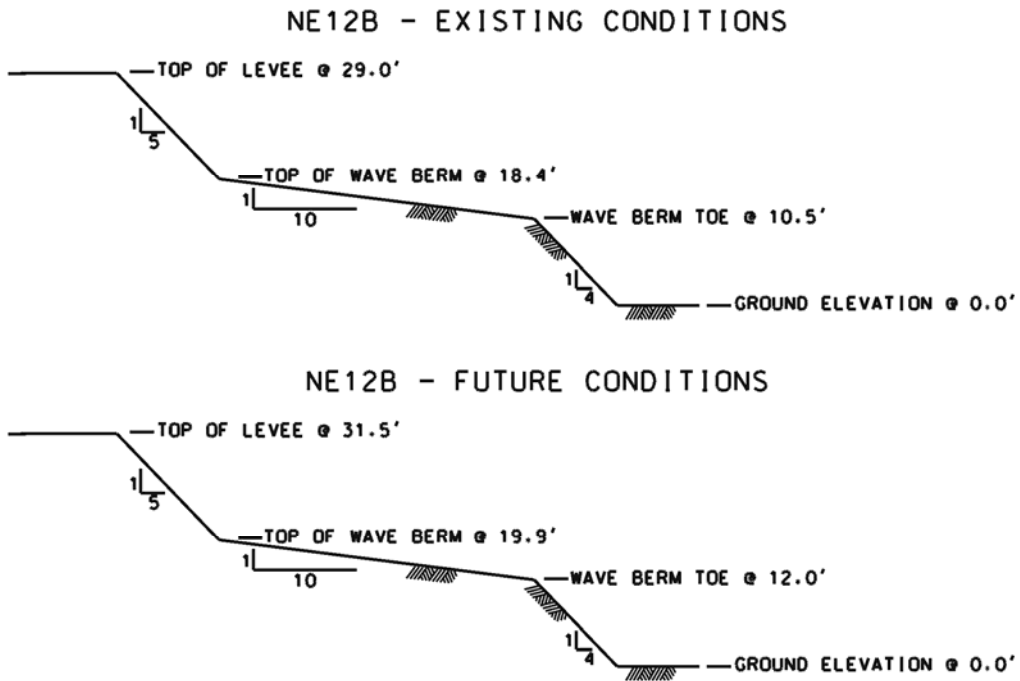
Typical Levee Design Cross-Section – New Orleans East Back Levee (NE12B) for existing (upper panel) and future conditions (lower panel).
